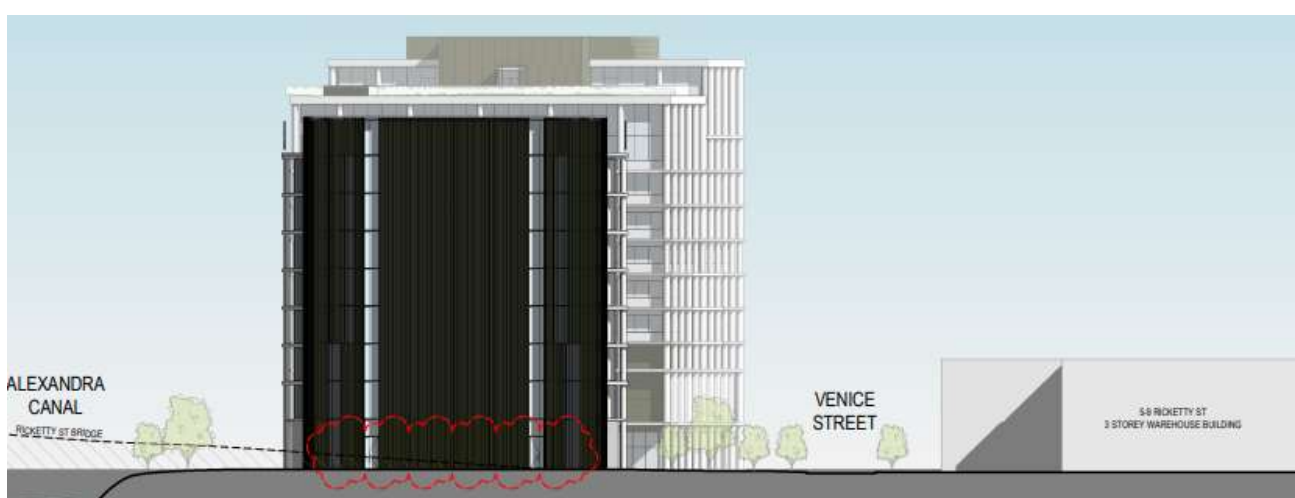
Southern elevation (from Ricketty Street) [supplied by applicant]
